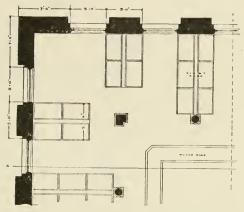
Chicago Academy of Sciences. Plan of second or gallery floor (in part).
